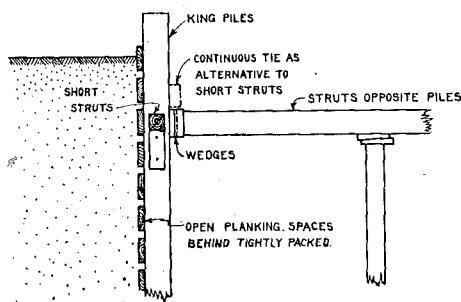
OPEN SHEETING METHOD OF EXCAVATION.
